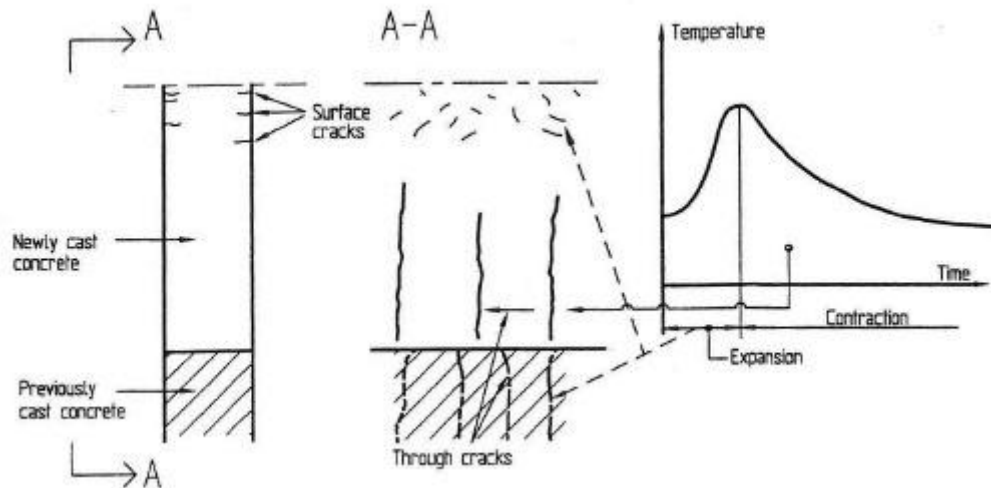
Examples of surface and through early thermal cracks in concrete (Betongföreningen. Kommittén för sprickor i betong, 1994).
